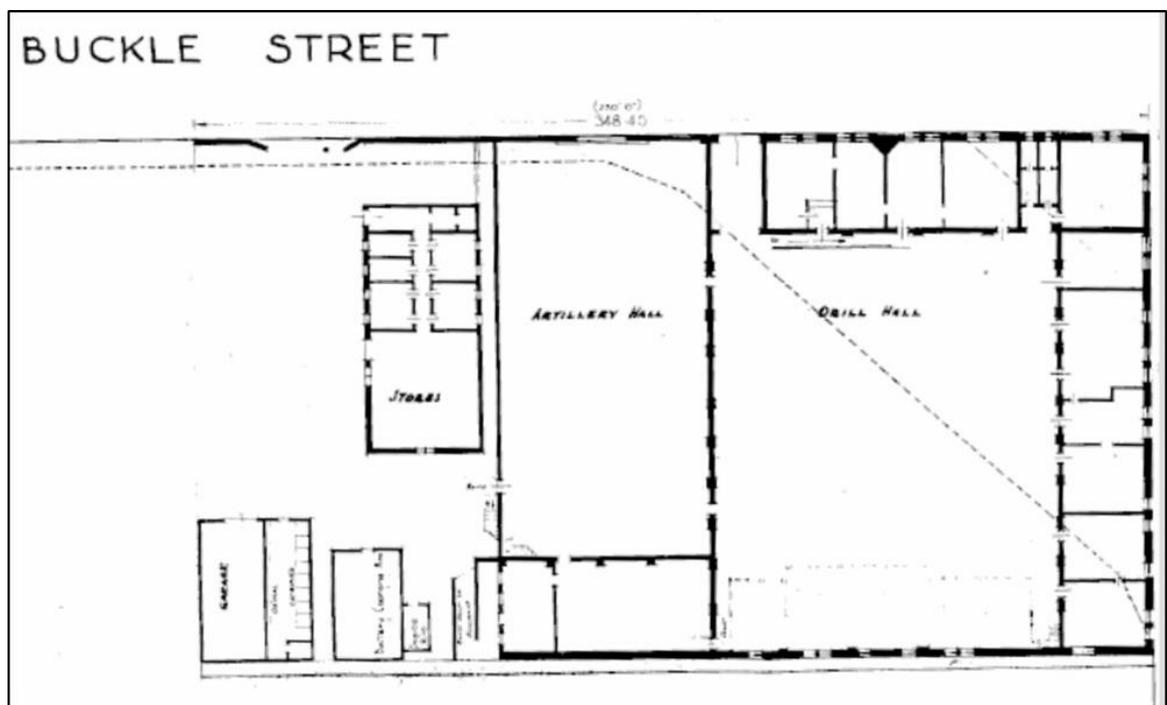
Plan G.2788 Sheet 3 of 4, dated 30 August 1955, showing the ground floor interior layout of the Wellington Garrison Hall, on the corner of Buckle and Taranaki Streets. Source: New Zealand Defence Force Archives
